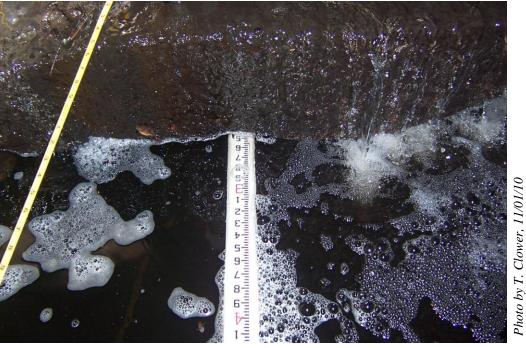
Facing South. 106' north of the cemetery entry manhole.
